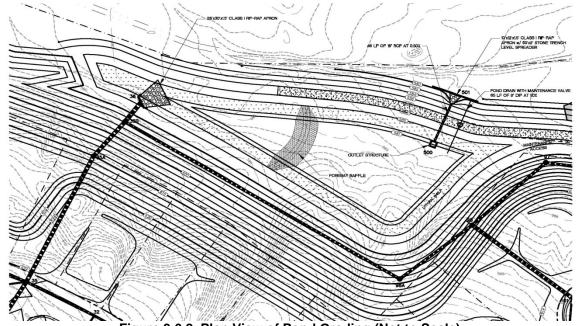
Plan View of Pond Grading (Not to Scale)
